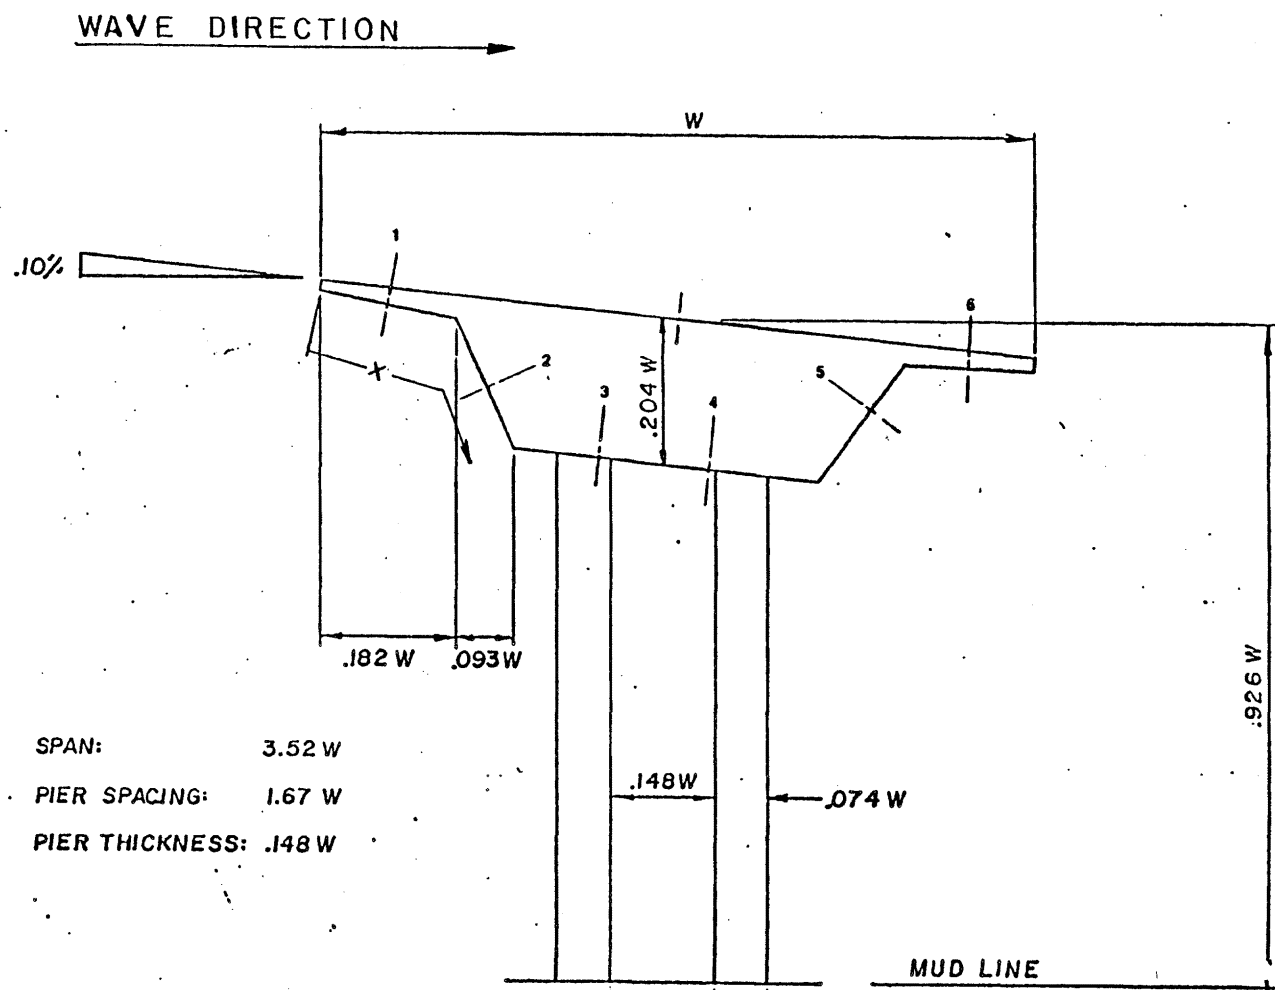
Box Girder Bridge Model with Pressure Transducer Locations
